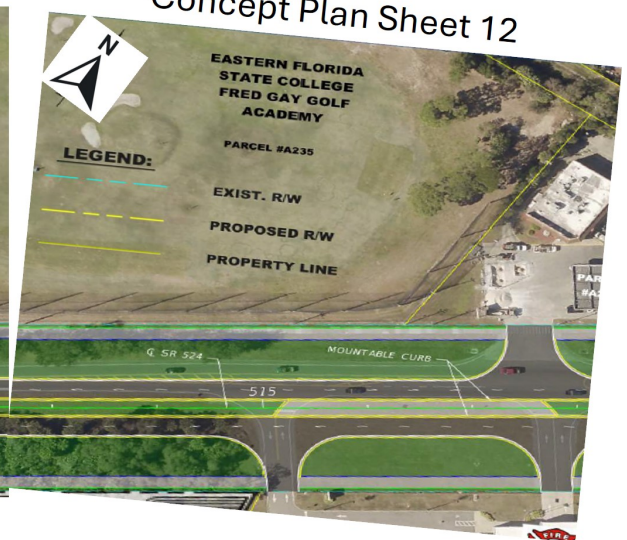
Concept Plans Showing Project Improvements Adjacent to Golf Academy
